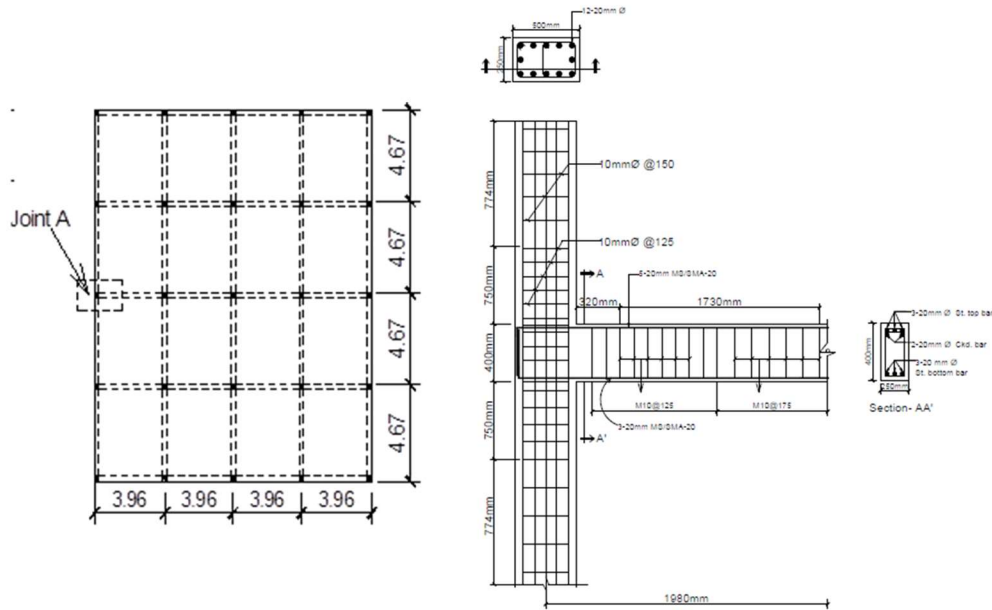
(a) Plan of a seven storey residential building (Dimension in meters) (b) Reinforcement detailing of beam-column joint
